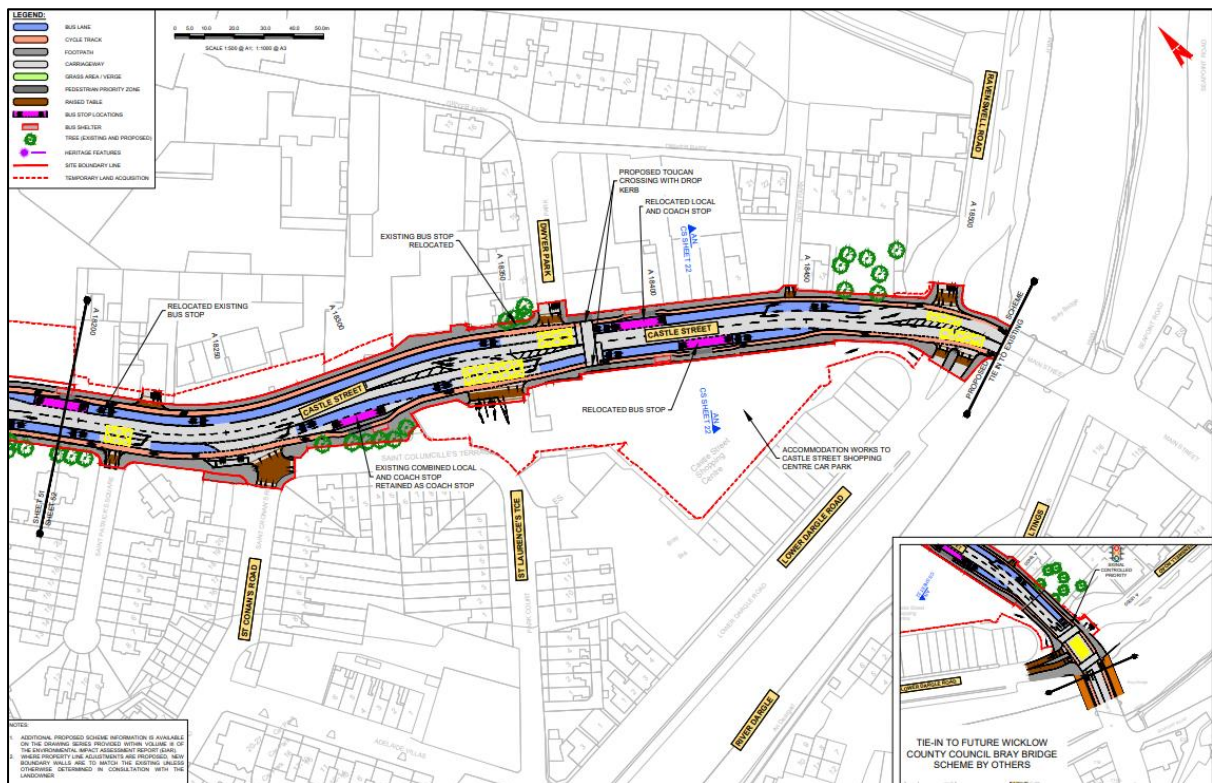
Extract from General Arrangement Drawings at Castle Street (Sheet 52)
